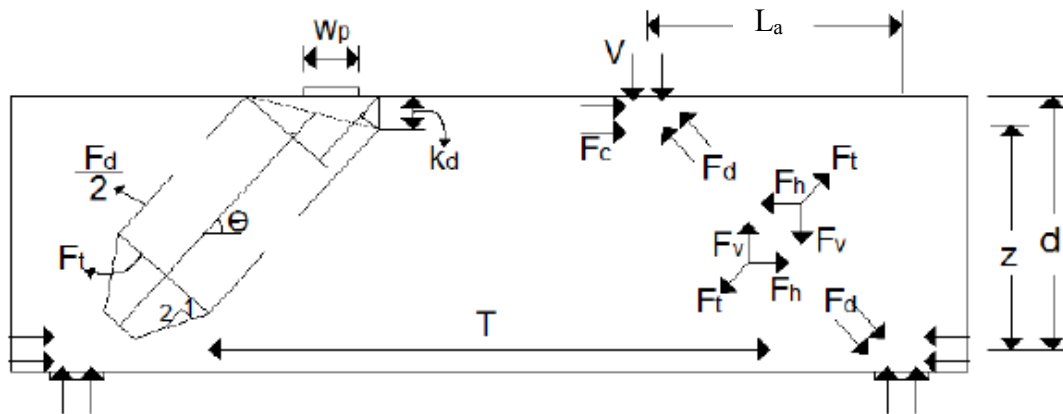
Park and Kuchma strut-and-tie model for a deep beam [27]
